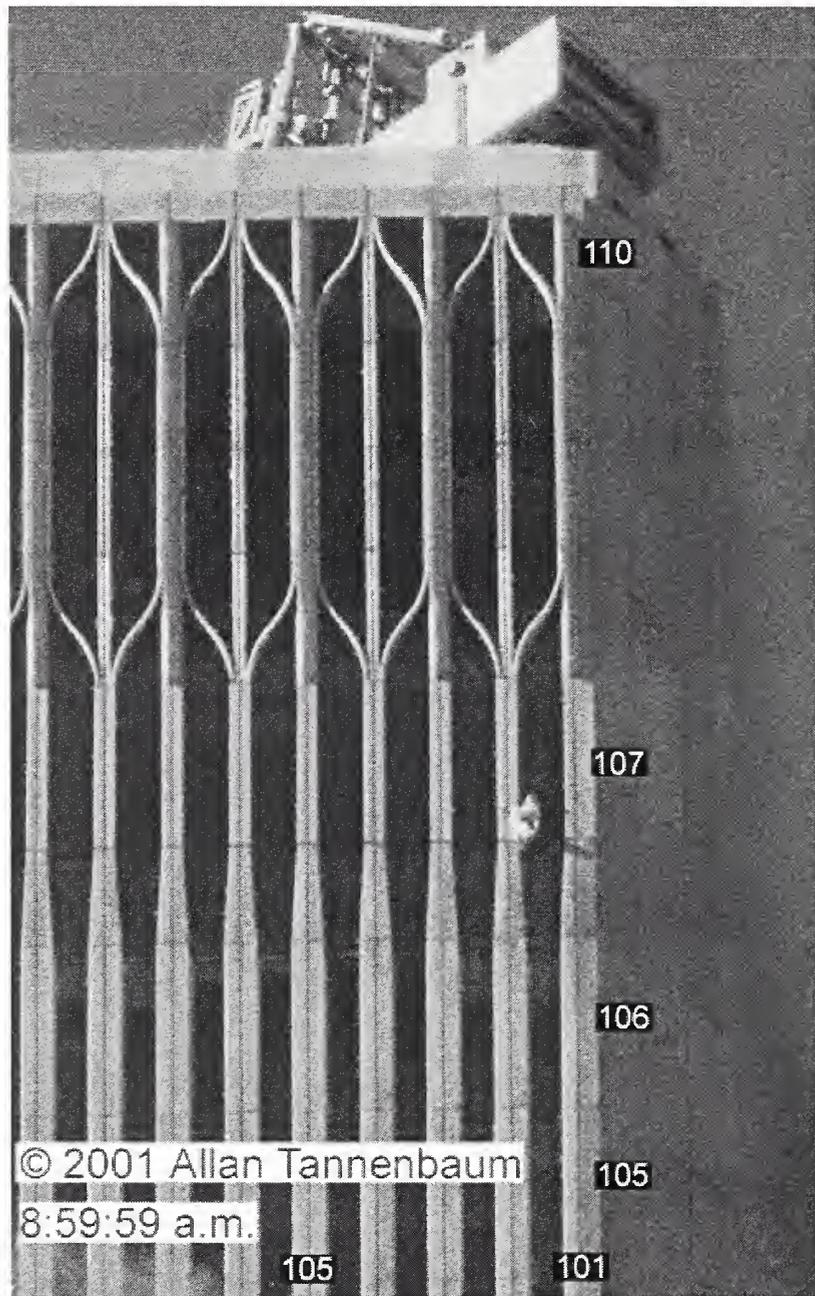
This cropped photograph showing an area of the façade on the north face of WTC 1 near the top of the tower was taken at 8:59:59 a.m. A mechanical equipment room is present on the 108th and 109th floors. Column and floor numbers have been added.
